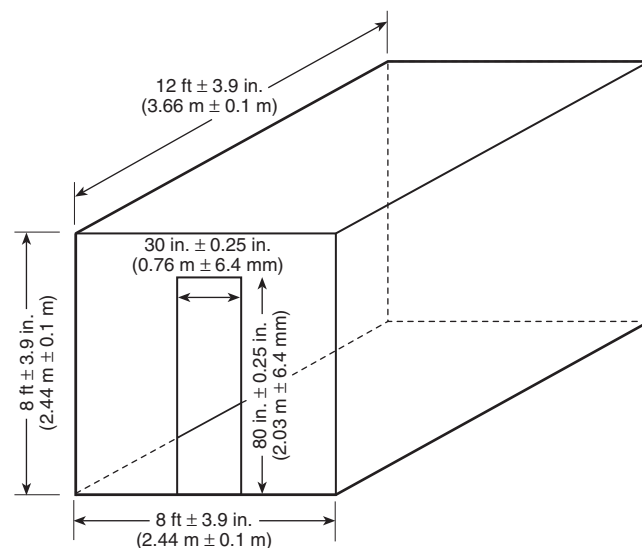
Interior room dimensions and interior doorway dimensions.
